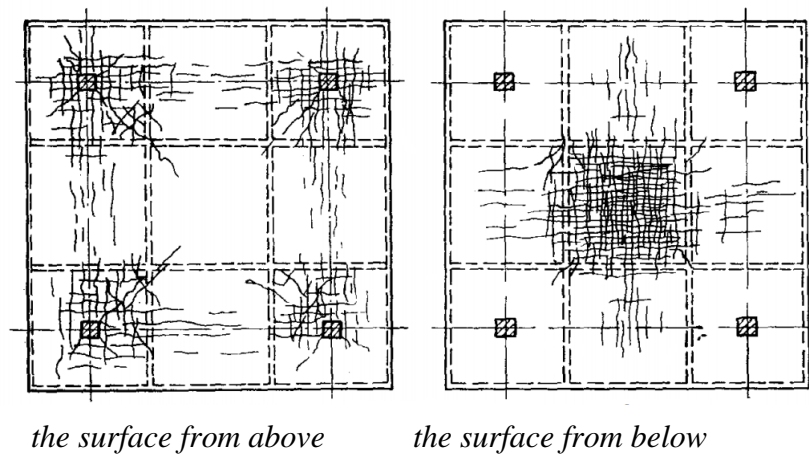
Diagrams of cracks located in the elements of the floor slab fragment, when tested
